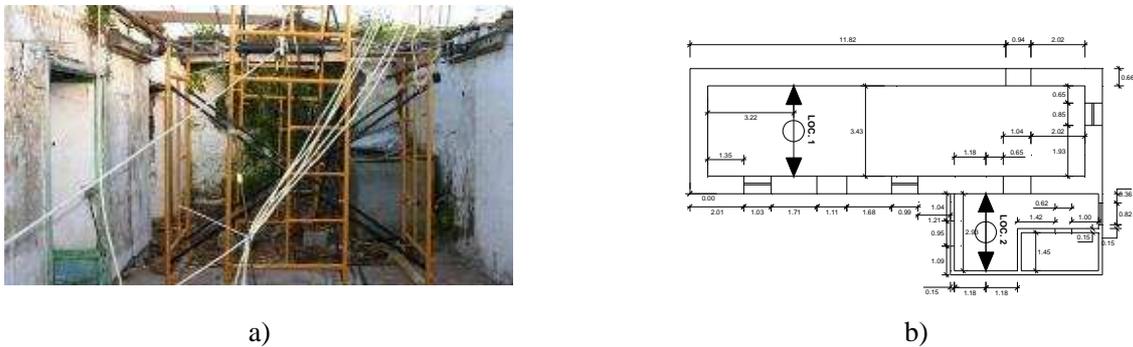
Basics of the testing layout in house 1: a) general inside view; b) plan layout and test locations.
